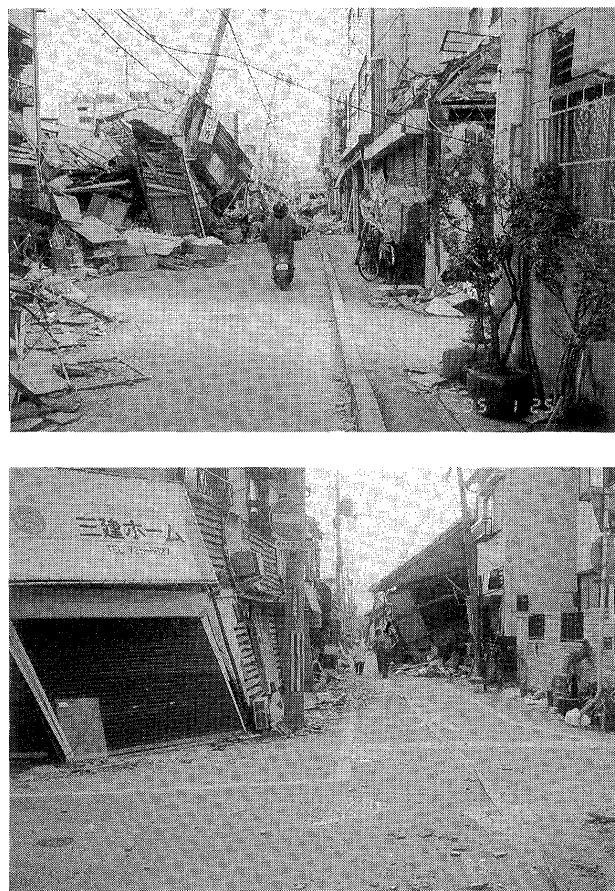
Photographs of typical collapsed wood buildings. Upper : The first floor of the building on the road was entirely collapsed, although the second floor left its original shape. The first floor of the left side building was tilted to the same direction as that of the collapsed building on the road. Lower : Notice that the buildings collapsed on the road came mostly from the left side.
